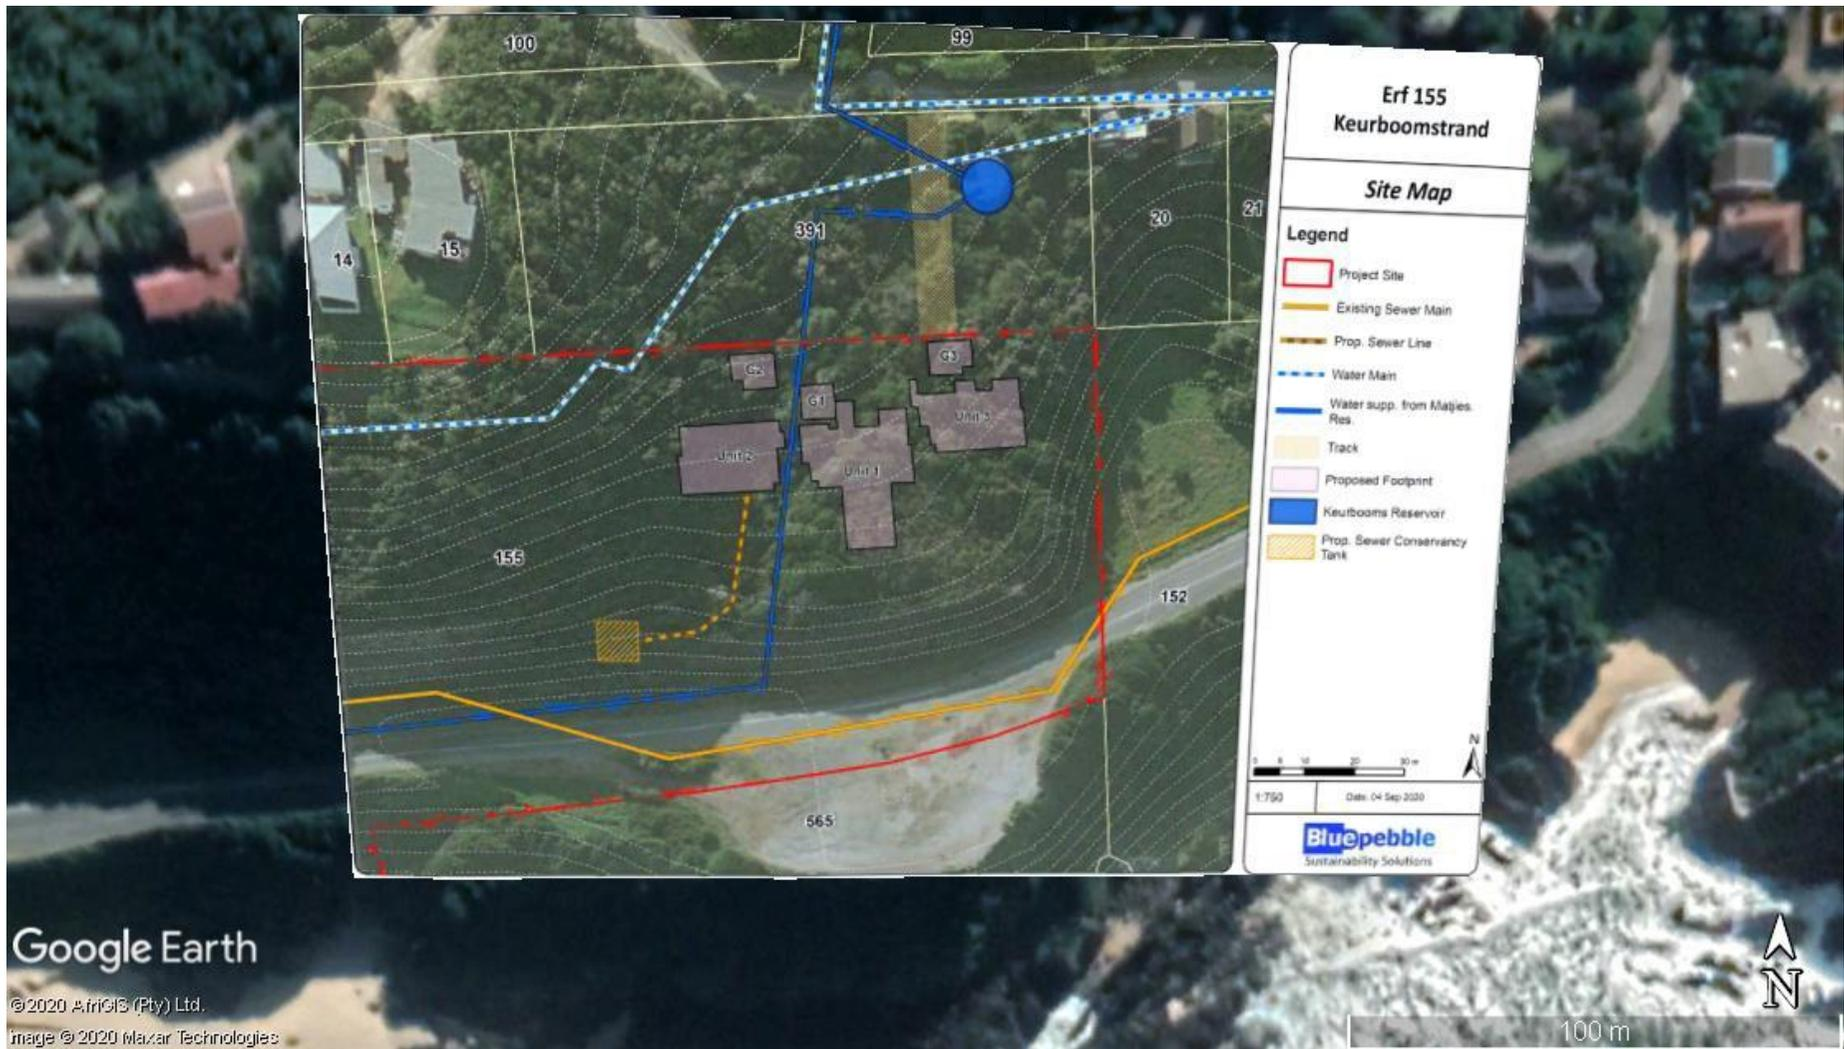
Conceptual site development plan overlaid on the eastern extent of Erf 155 and Erf 391, Keurboomstrand. Courtesy of Bluepebble (Mr Jonathan Kingwill) and Google Earth 2020.
